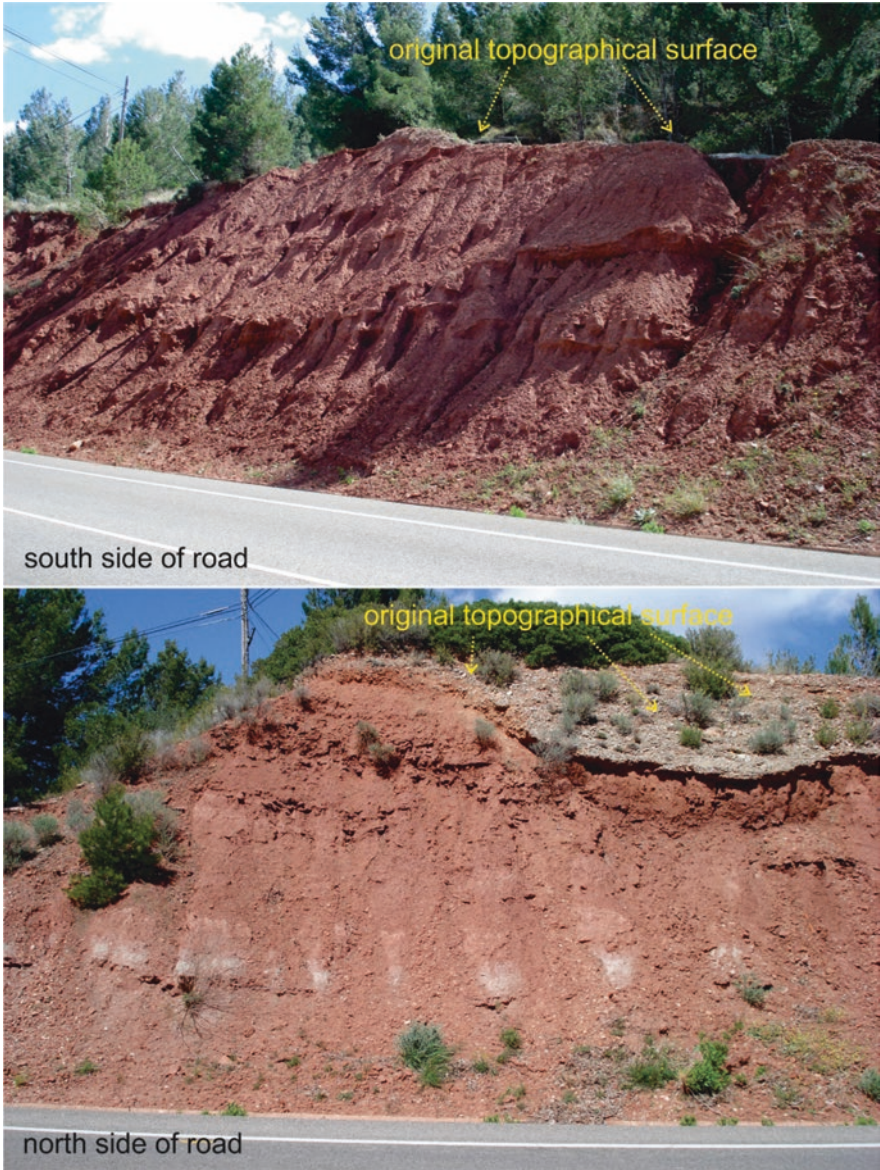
Road cut slopes excavated in gypsum-cemented siltstone about 5 years after excavation. The slopes were excavated as a plane surface with a slope angle of about 60° . The slopes are instable and eroded due to solution of gypsum after excavation. The north side is less affected than the south side, likely due to more direct sunlight on the north side and the pre-failing wind direction. The protrusive banks in the south side and greyish areas in the north side are layers mainly consisting of gypsum with little silt that are slightly more resistant to solution and erosion (Road C44 near Vandellòs, Catalunya, Spain)
